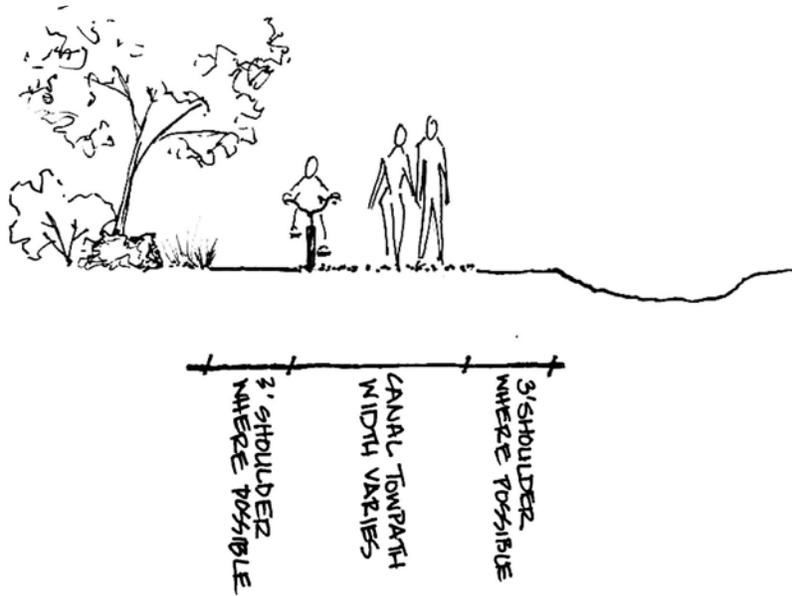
The existing canal towpath has varying widths, and is rarely 10' wide, as the AASHTO guidelines recommend. When the path is adjacent to a steep bank of the canal prism, a 3' shoulder should be provided between them.
